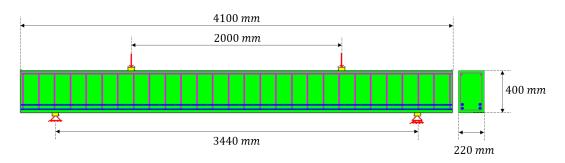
Beam designed following MC2010 recommendations: (i) green: concrete material, (ii) blue: tensile longitudinal rebars and (iii) pink: stirrups and compressive longitudinal bars
